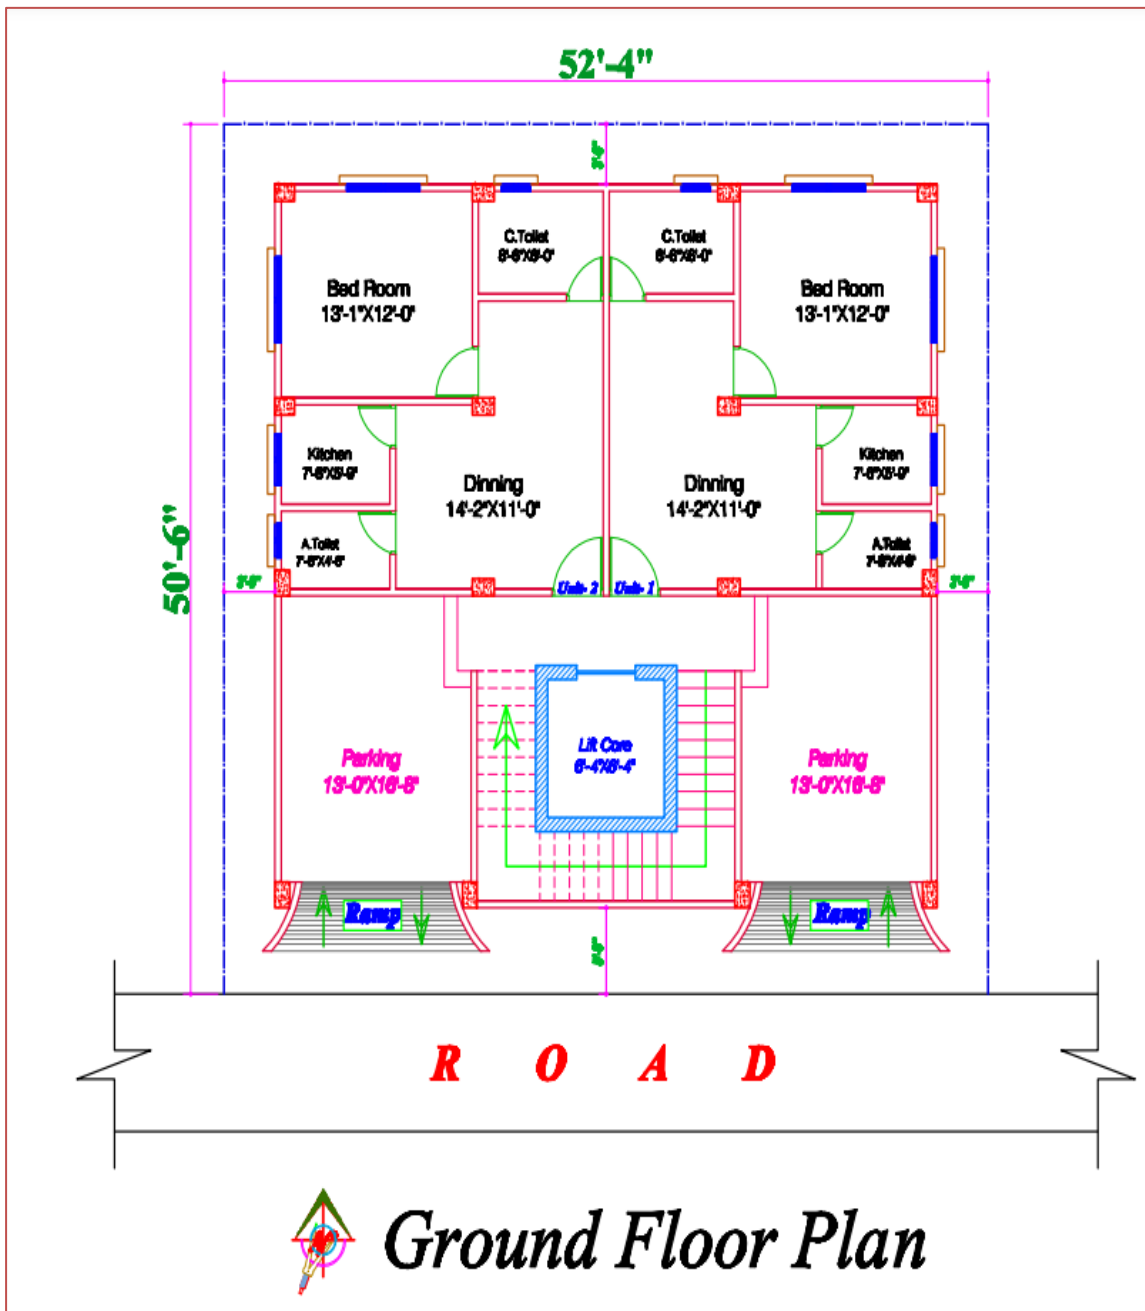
4(b): Architectural Plan for both option (Ground Floor Plan)
